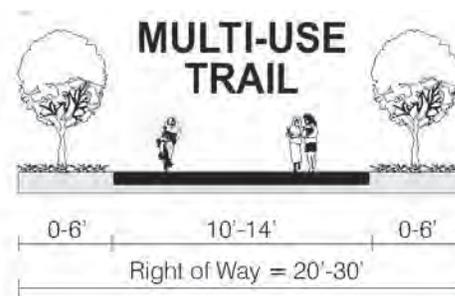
Canby TSP Multi-Use Trail Cross-Section
